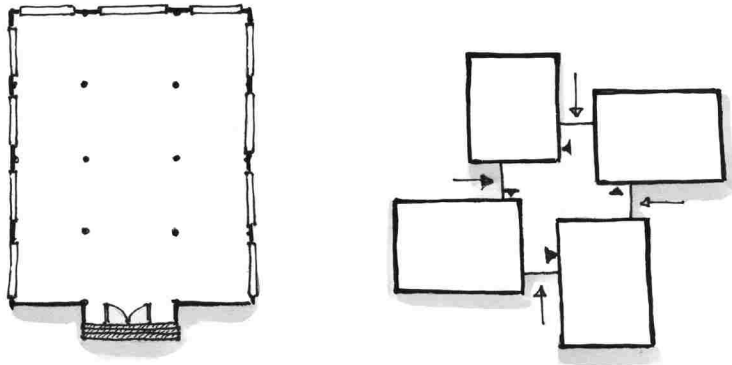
Two potential types of flexible space: open floor plan vs modular units
